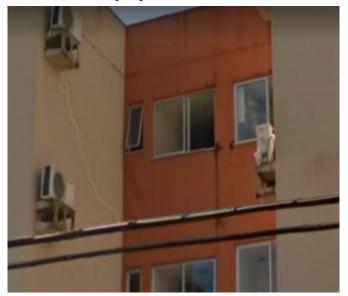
Cracks in the facade of the residential building. Source: Author's Collection, 2019.
